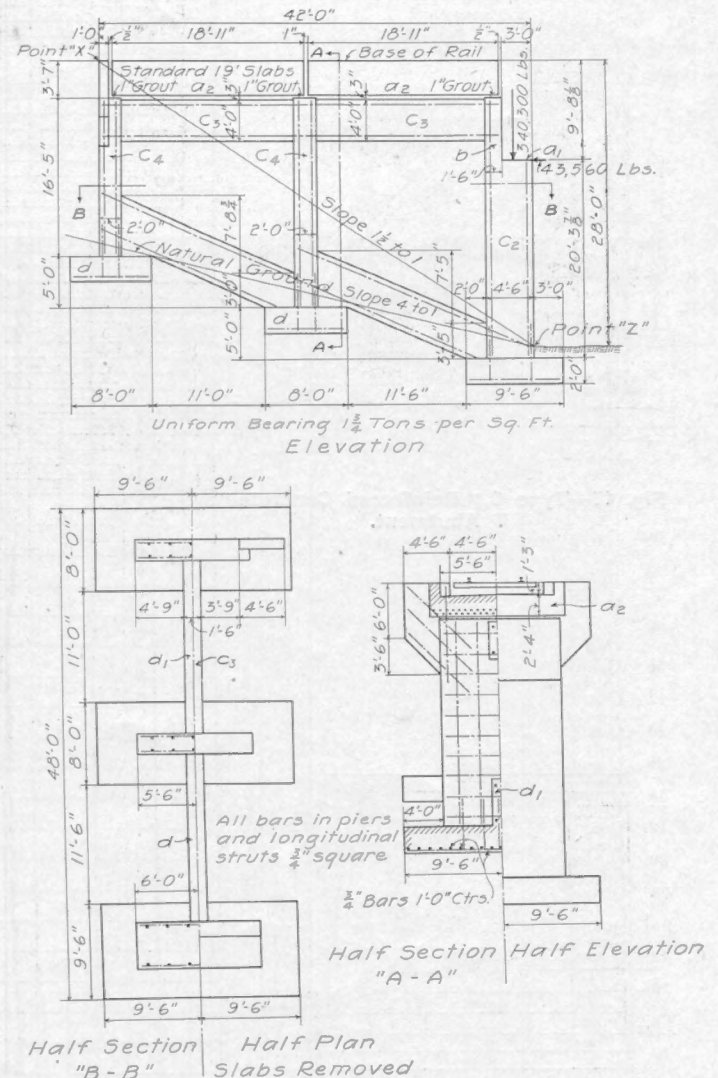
Type C_7 ; Reinforced Concrete Trestle Abutment.
